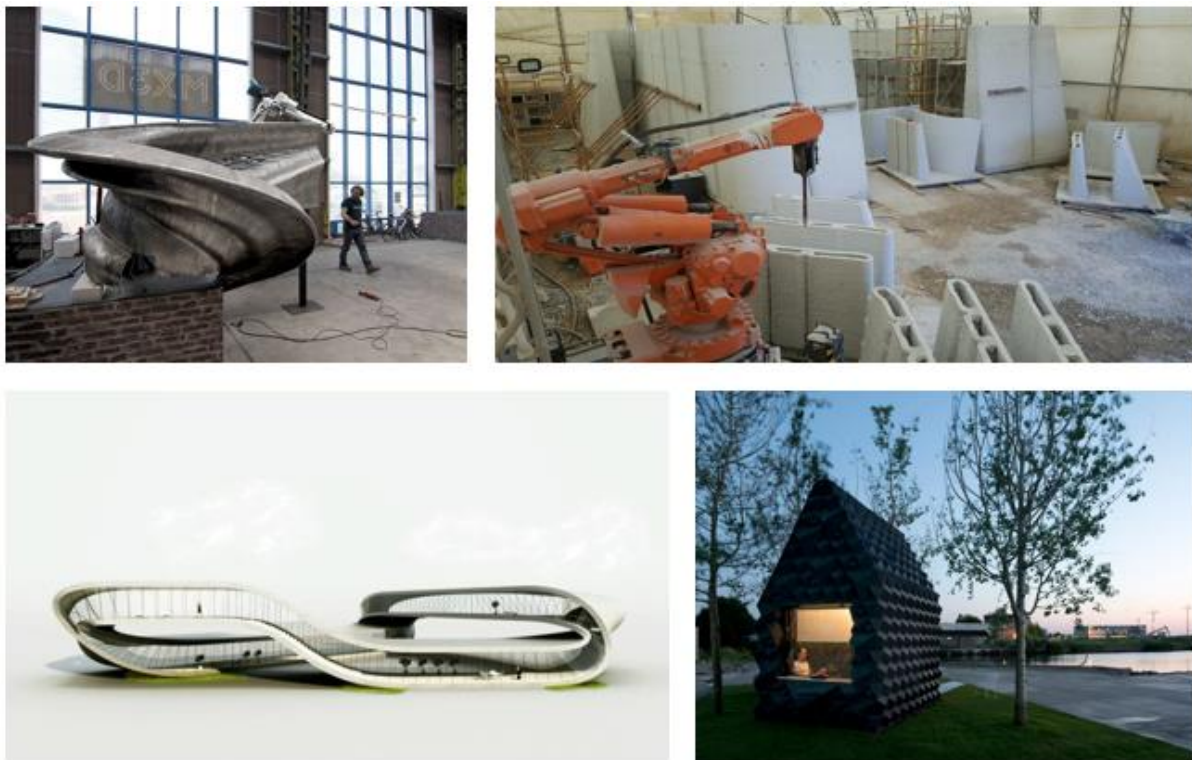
MX3D BRIDGE (STEEL) (LAARMAN, 2017), R&DRONE LABORATORY (CONCRETE) (SAUNDERS, 2017), LANDSCAPE HOUSE (STONE) (TESS, 2016) 3D PRINTED MICRO HOME (PLASTIC) (FREARSON, 2016)
